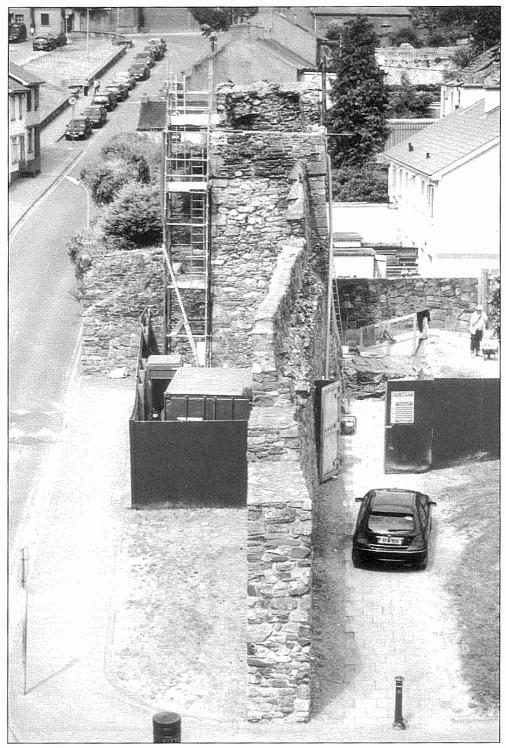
Double Tower from southeast, showing section of city wall running to Manor Street in the foreground.
